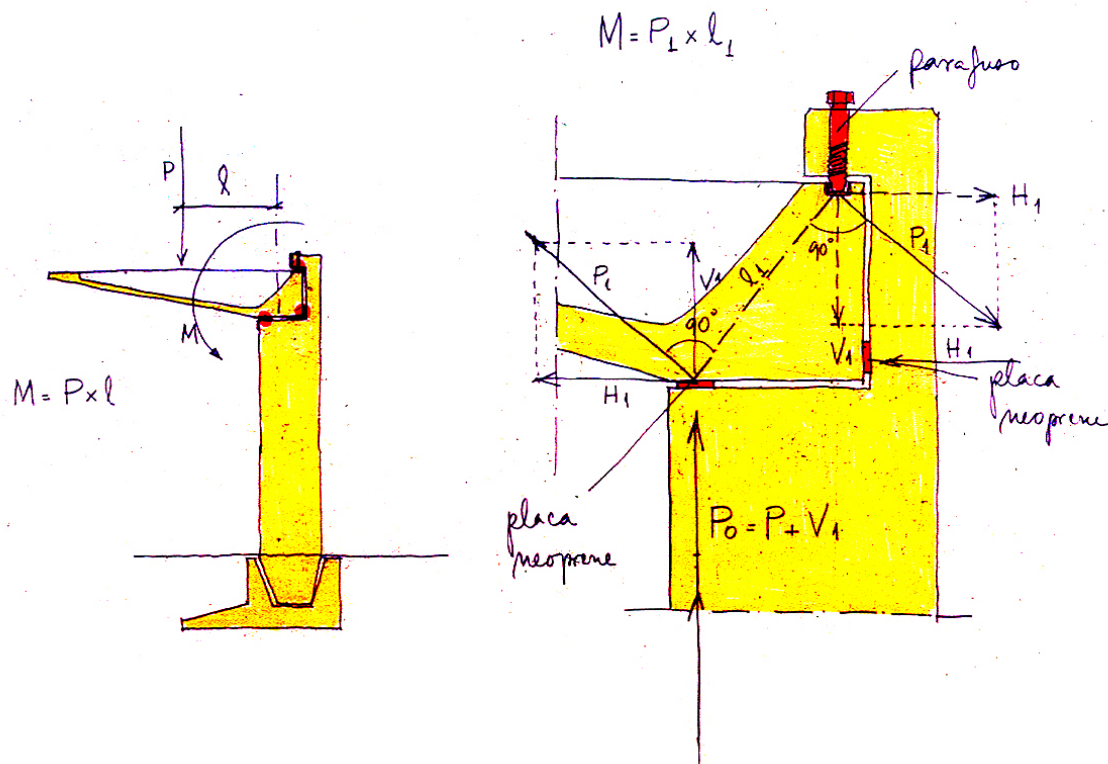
RENURB bus shelter force scheme. The roofing element is connected to the column at three different points (in red), as shown in Lelé's drawing. Arquivo João Filgueiras Lima, Salvador
